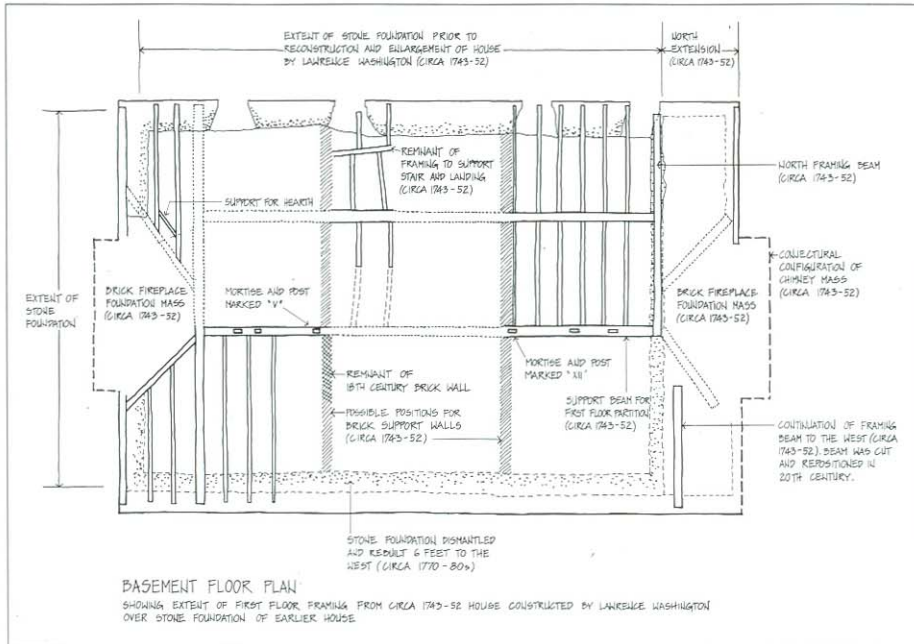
Evidence of Lawrence Washington's 1743-52 house was most apparent in the basement. Lawrence built his house on the stone foundation of an earlier house. George Washington used those stone walls and some of the framing from his brother's house in his initial expansion. This basement floor plan shows the extant c.1743-52 framing members that support the first floor rooms.
